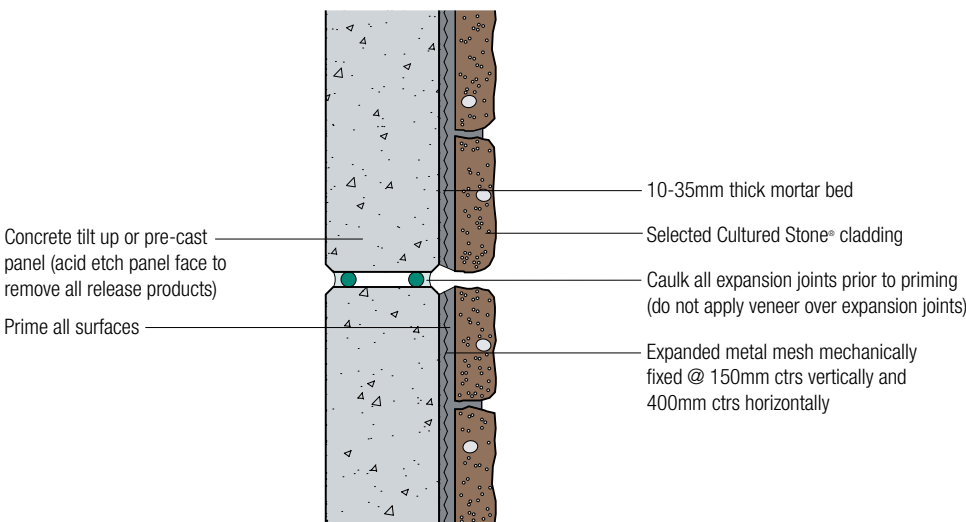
Concrete Tilt Up or Precast Panel - Plan (Dwg # CS-03.03)
